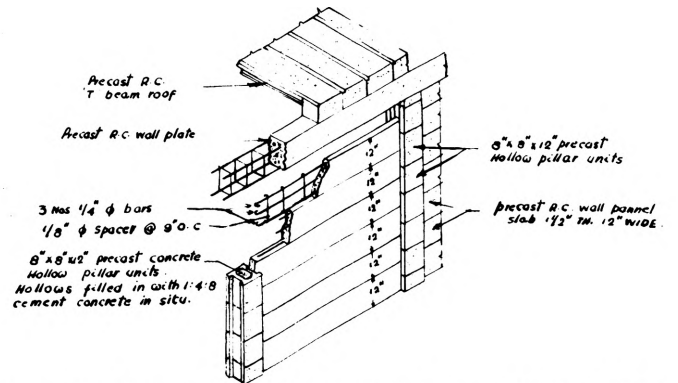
GENERAL DETAILS OF PILLAR AND PANEL CONSTRUCTION.
